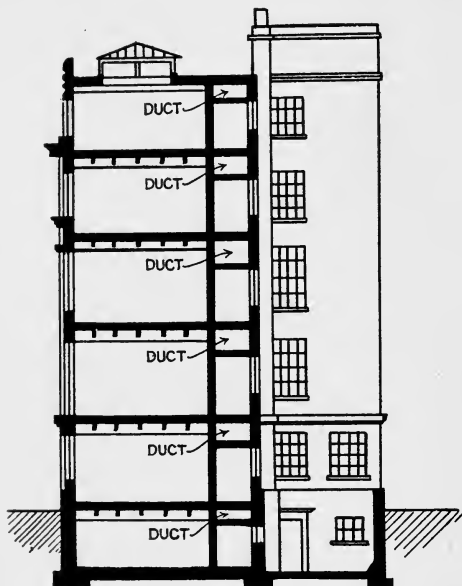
DUCT ARRANGEMENTS, FOUR-STOREY RESEARCH BUILDING
